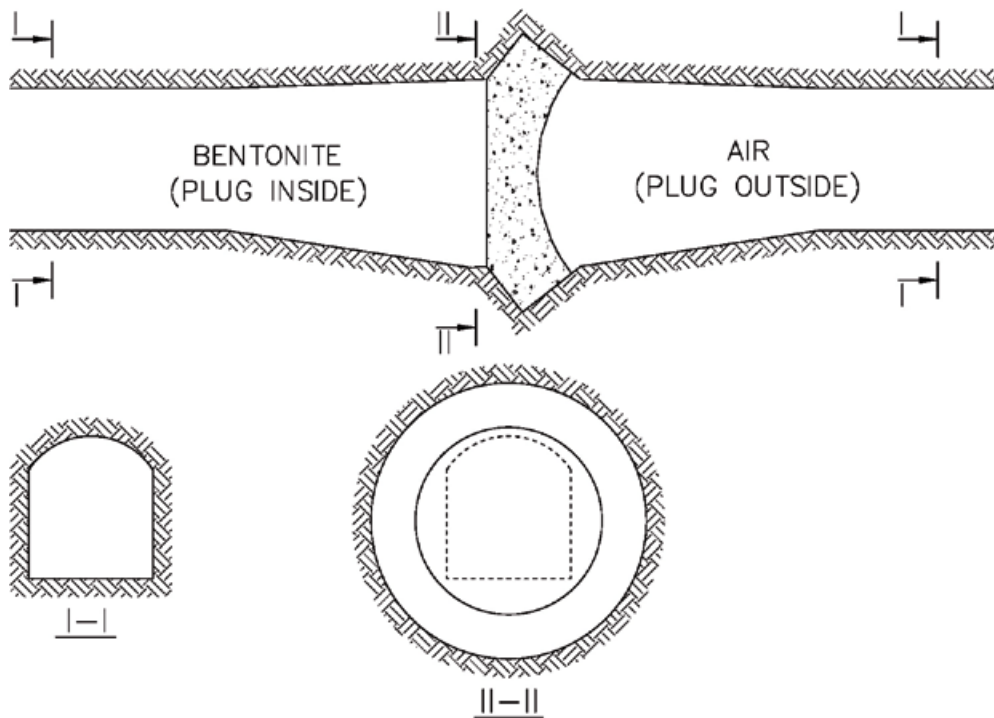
Schematic illustration of widening of the cross section of the deposition tunnel.
